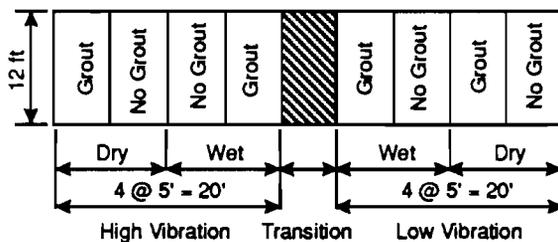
Typical field layout for a given surface preparation method (Ref 5).
